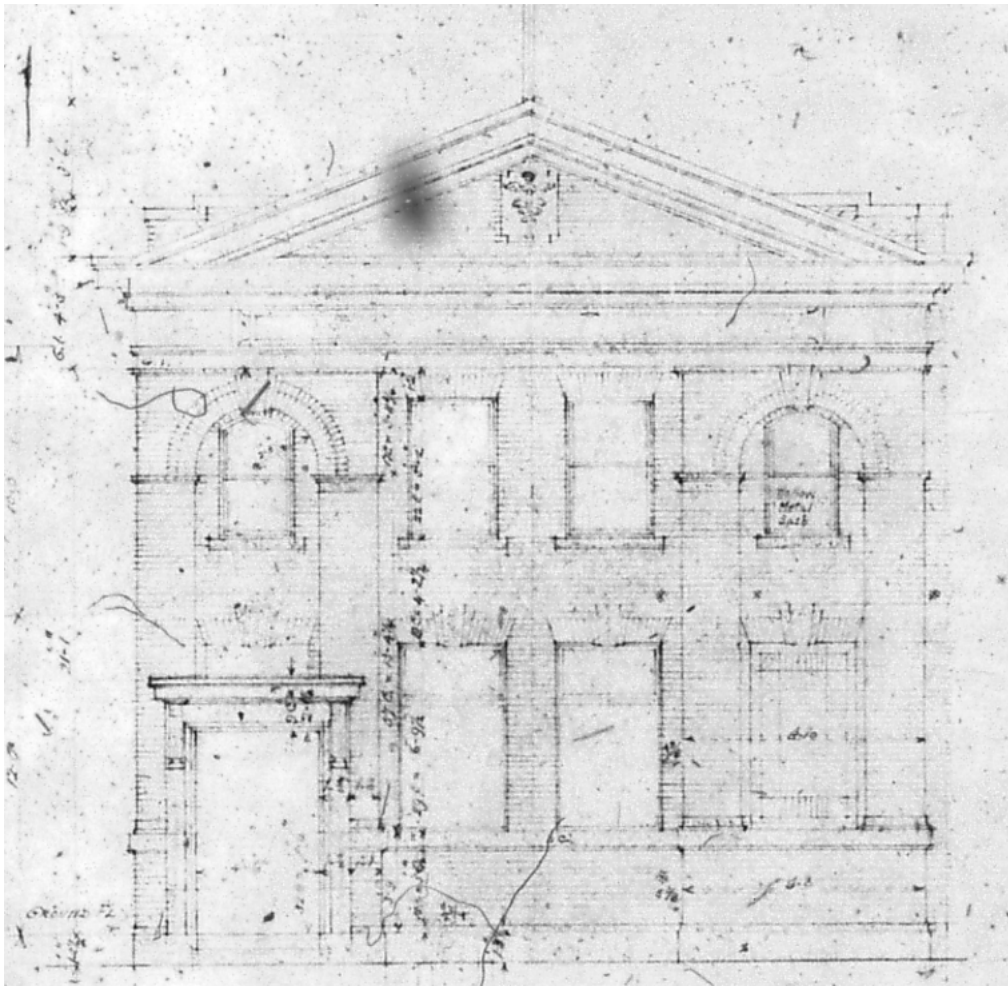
original south elevation architectural drawing of 1660 Kingston Road, August 9, 1921 (CIBC Archives)
